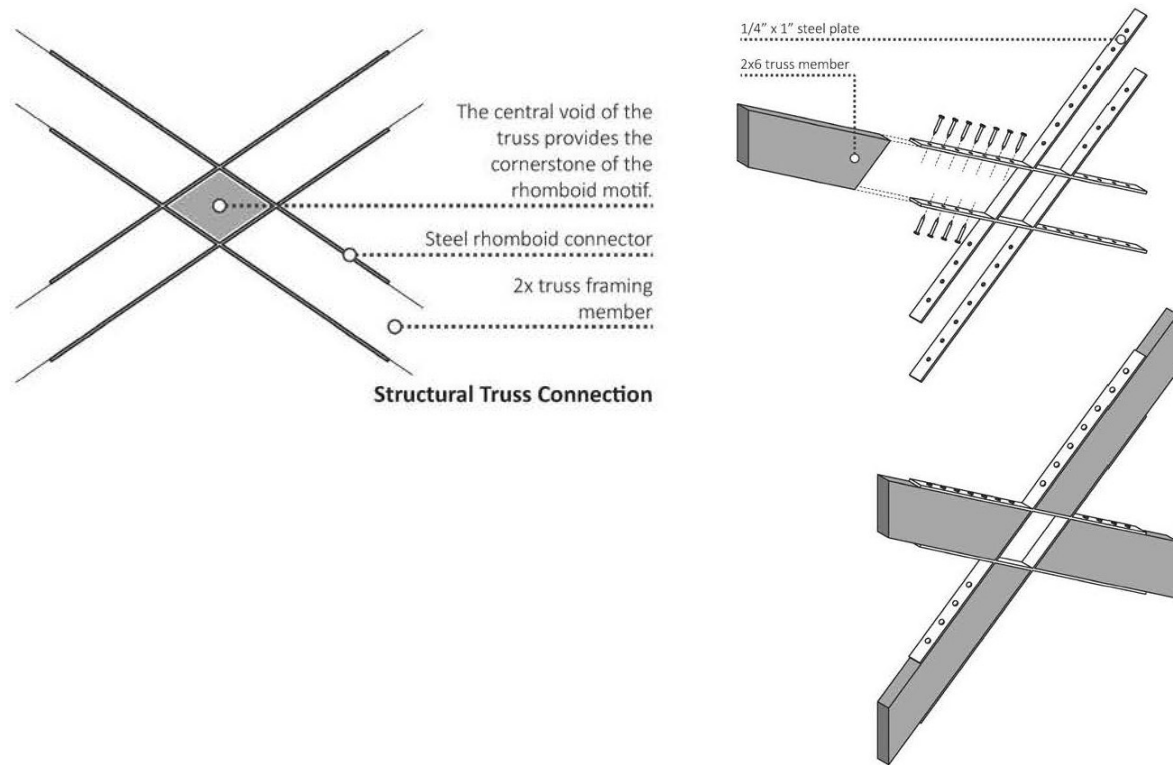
E. Fay Jones, structural truss connection diagram (left) and truss connection detail (right), Eureka Springs, AR, 2021.¹⁹
